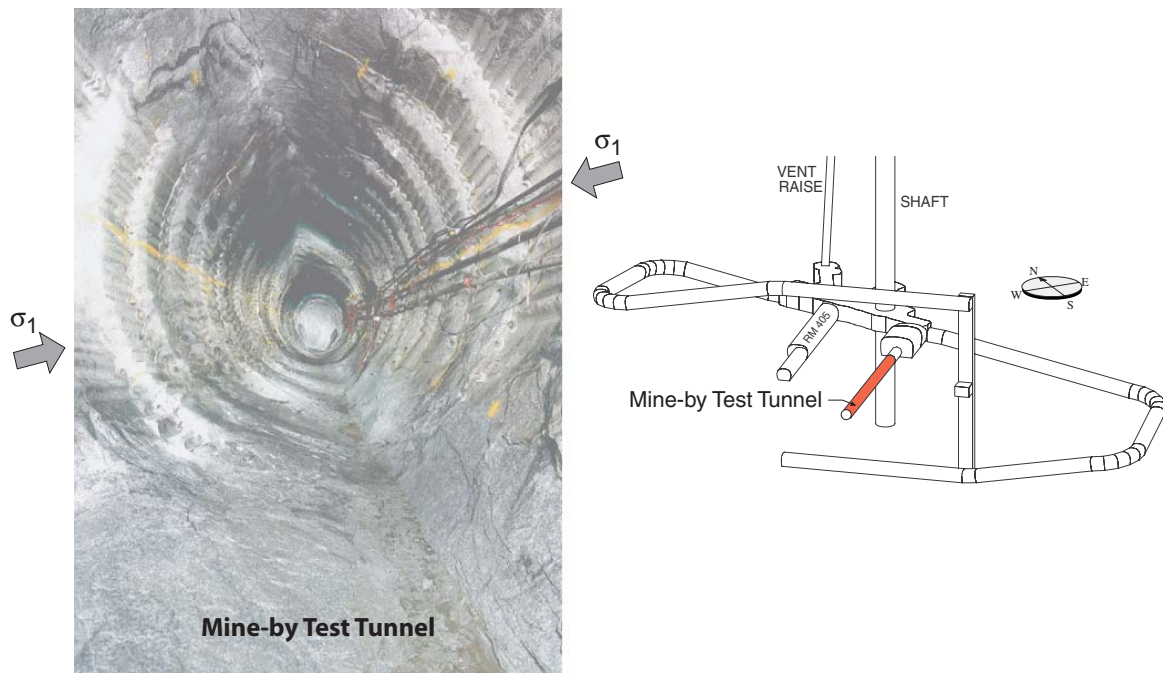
Layout of the Mine-by Experiment and a photo of the excavated test tunnel.
